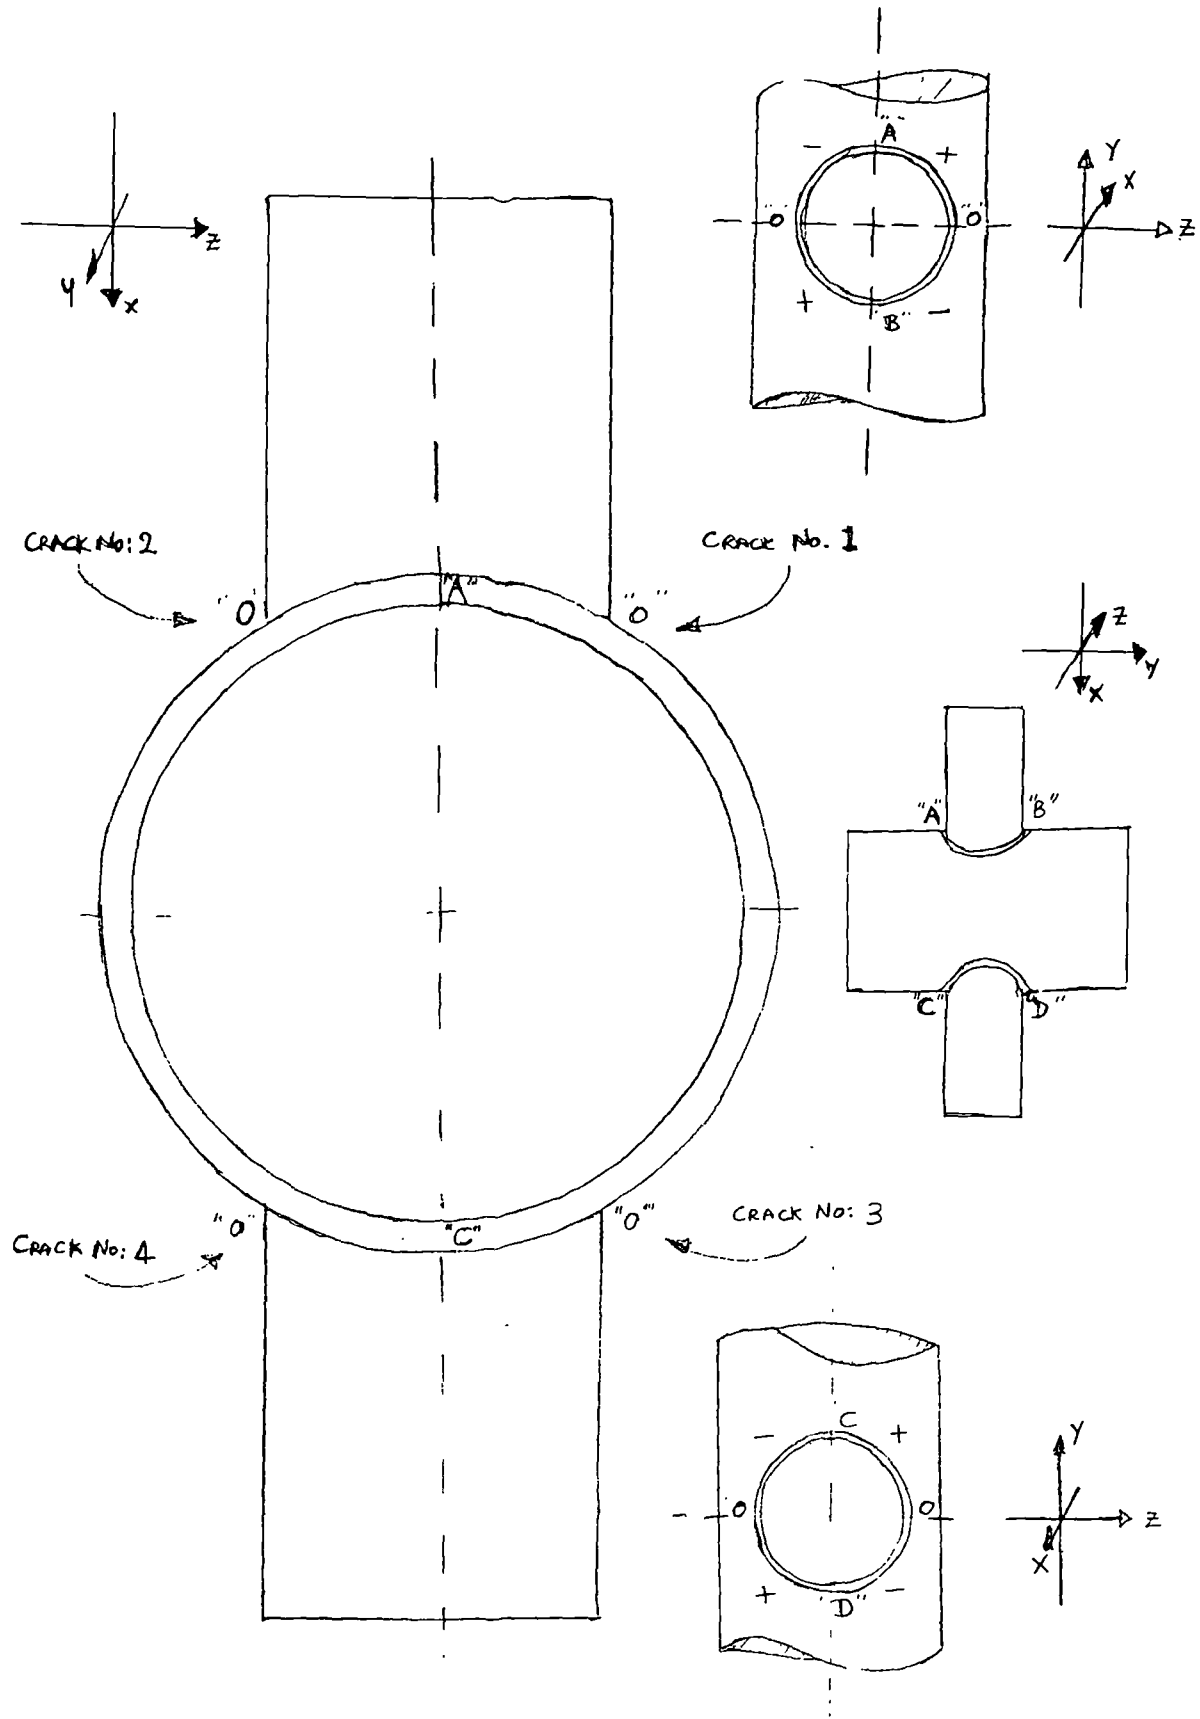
Double T-node of 50D steel, containing fatigue cracking in the weld areas A to B and C to D.
